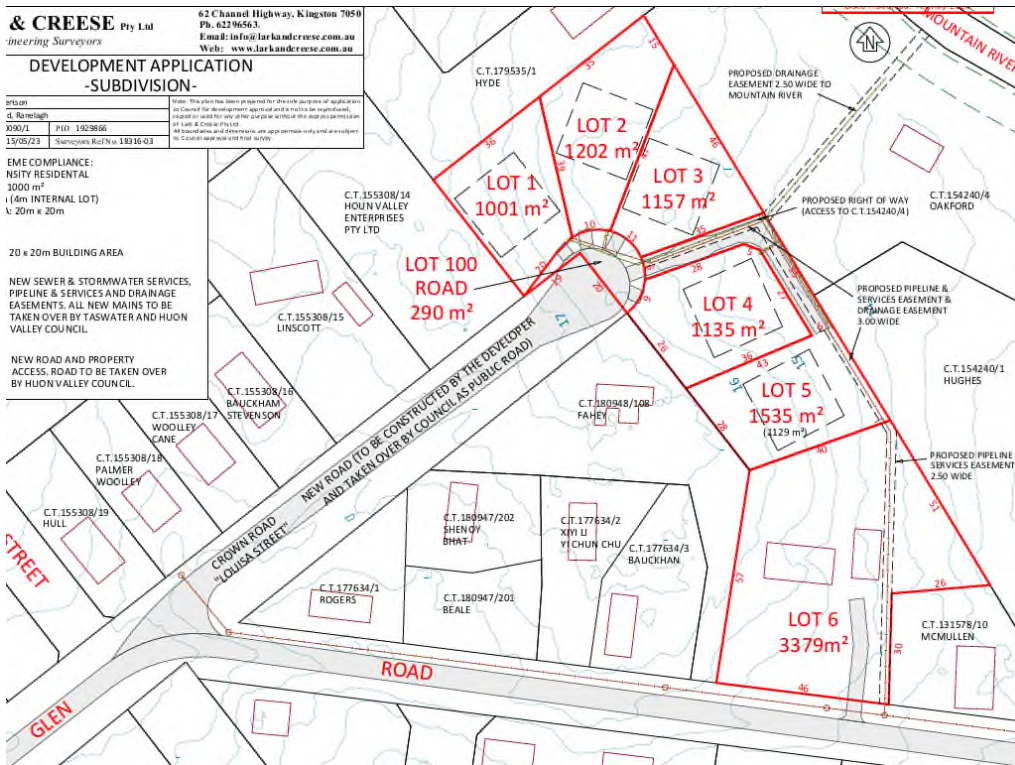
subdivision proposal plan showing the lot layout, and the construction of Louisa Street.
